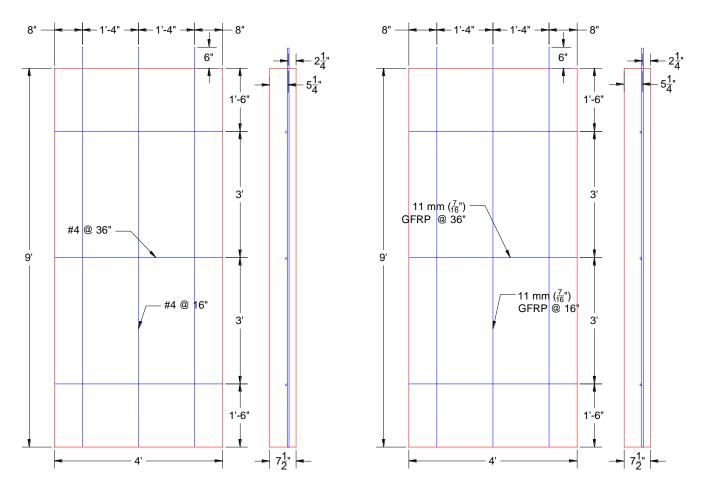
Configuration of the tested solid concrete wall panels with steel reinforcement (left) and GFRP reinforcement (right)
